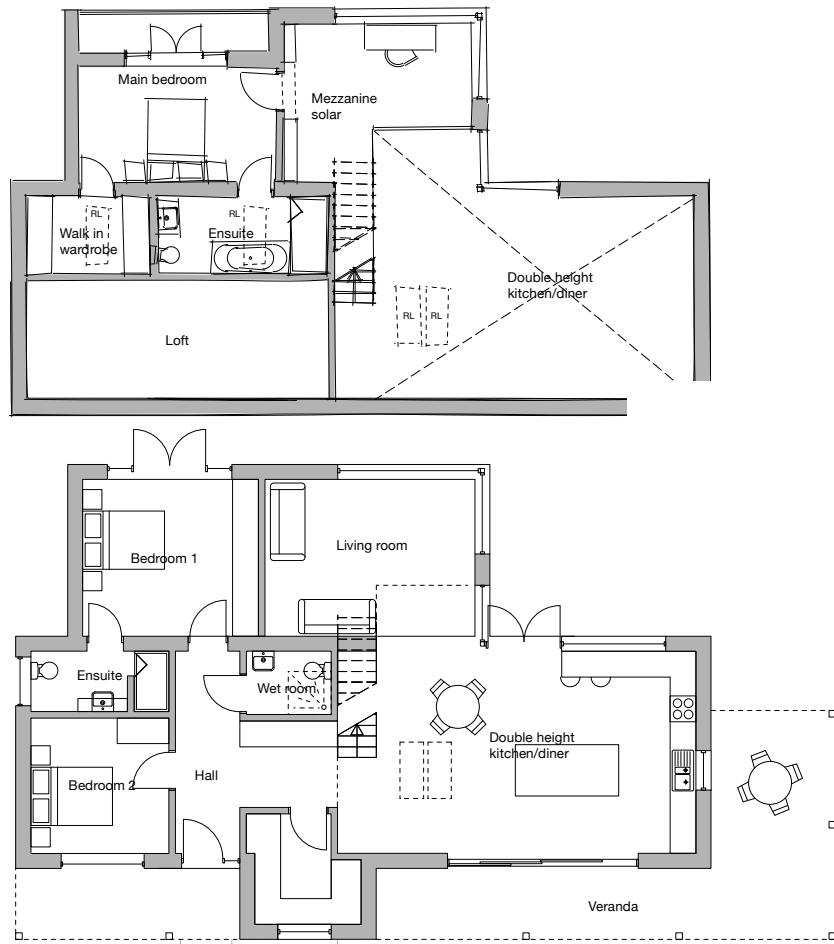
Plans and Elevations submitted for Pre-App advice in August 2023
